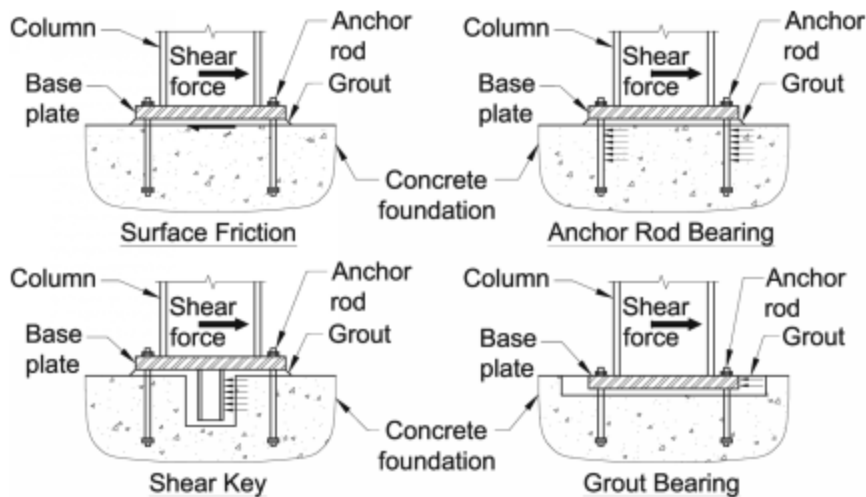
Shear transfer mechanisms—column supported by foundation.
